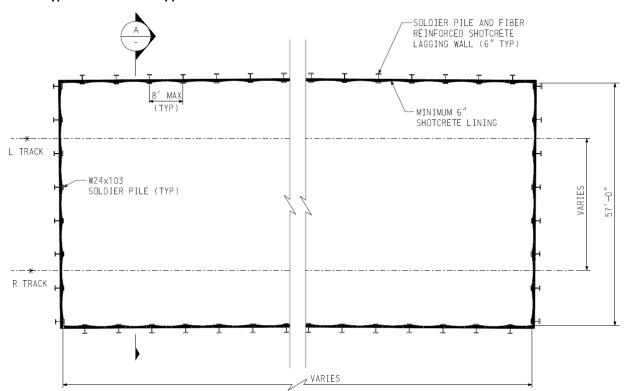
Plan of Typical LRT Station Support of Excavation
